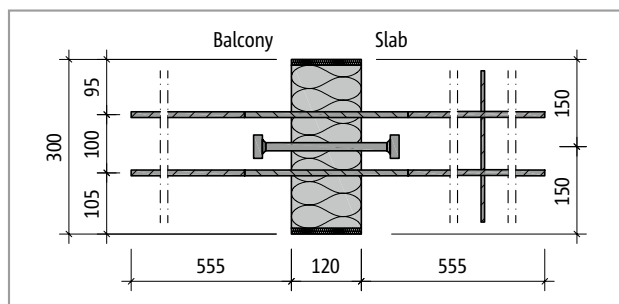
Schöck Isokorb® XT type Q-P-V1: Product plan view
